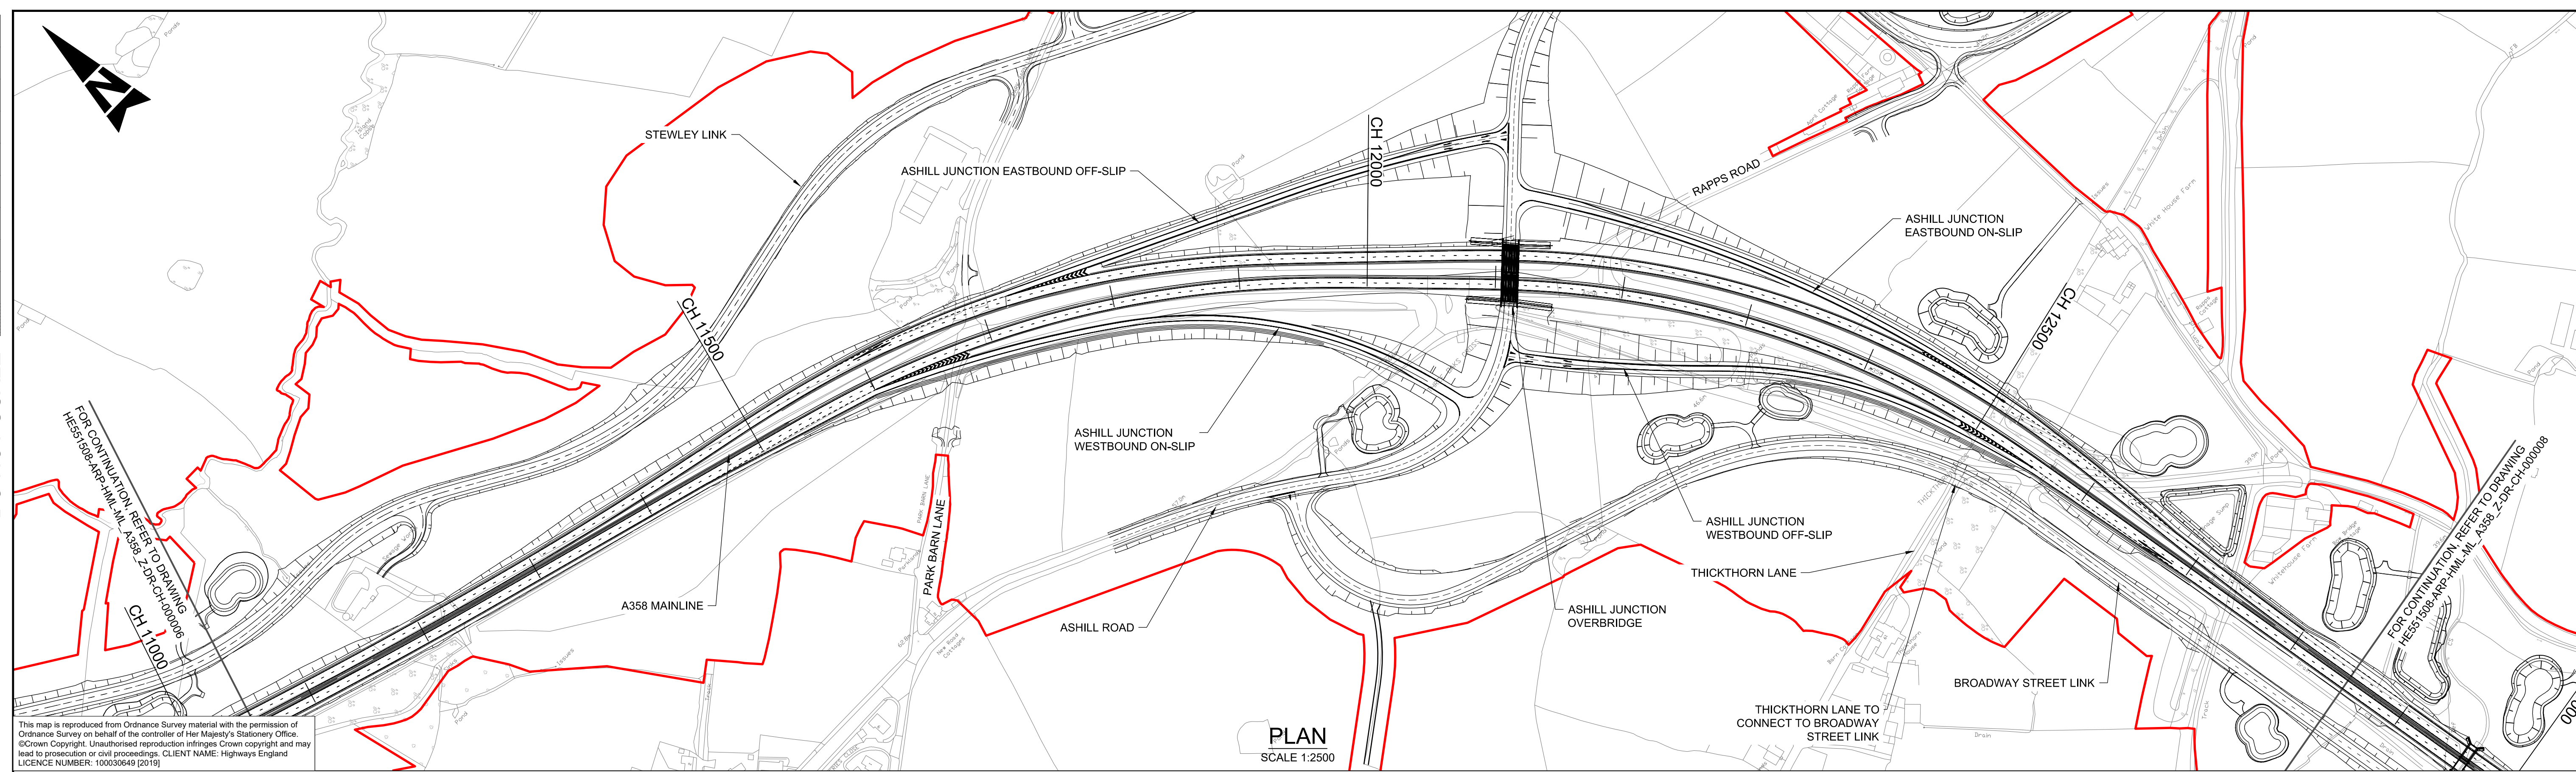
Drawing Title: A358 PLAN AND PROFILE SECTION 3 CAPLAND TO ASHILL JUNCTION
